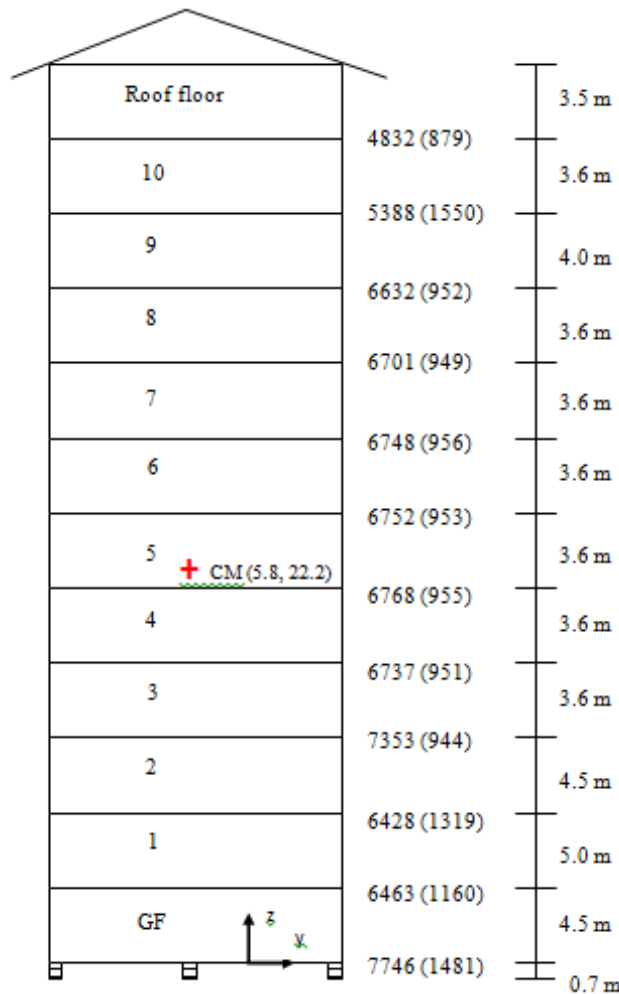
Elevation view of building with CM shown as  $\oplus$ . The distribution of loads at every floor with Dead Load (DL) and Live Load (LL in parentheses) shown.
